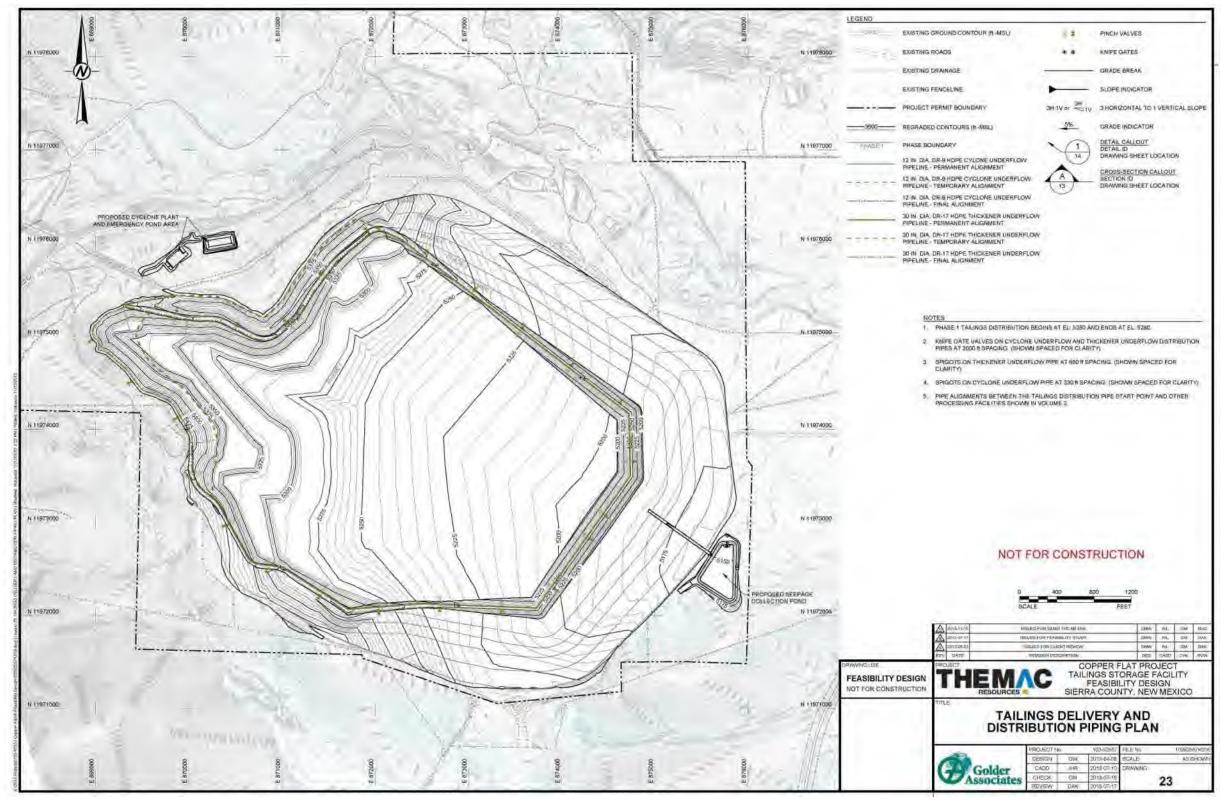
Tailings Delivery and Distribution Piping Plan
